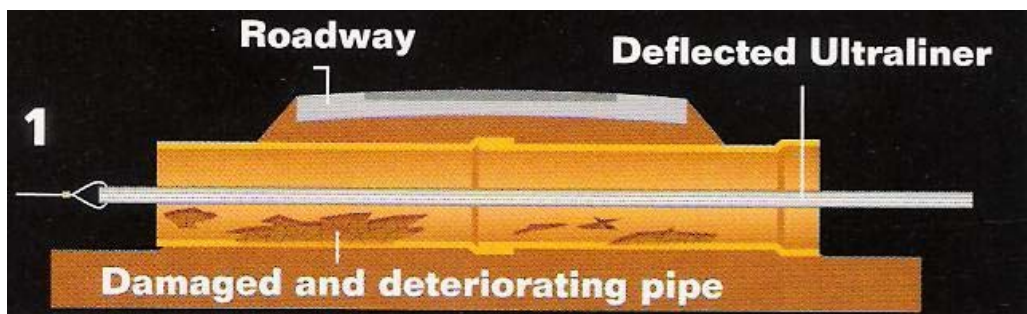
The Folded Thermoplastic Pipeline is pulled through the deteriorated culvert (ASCE, 2008).
